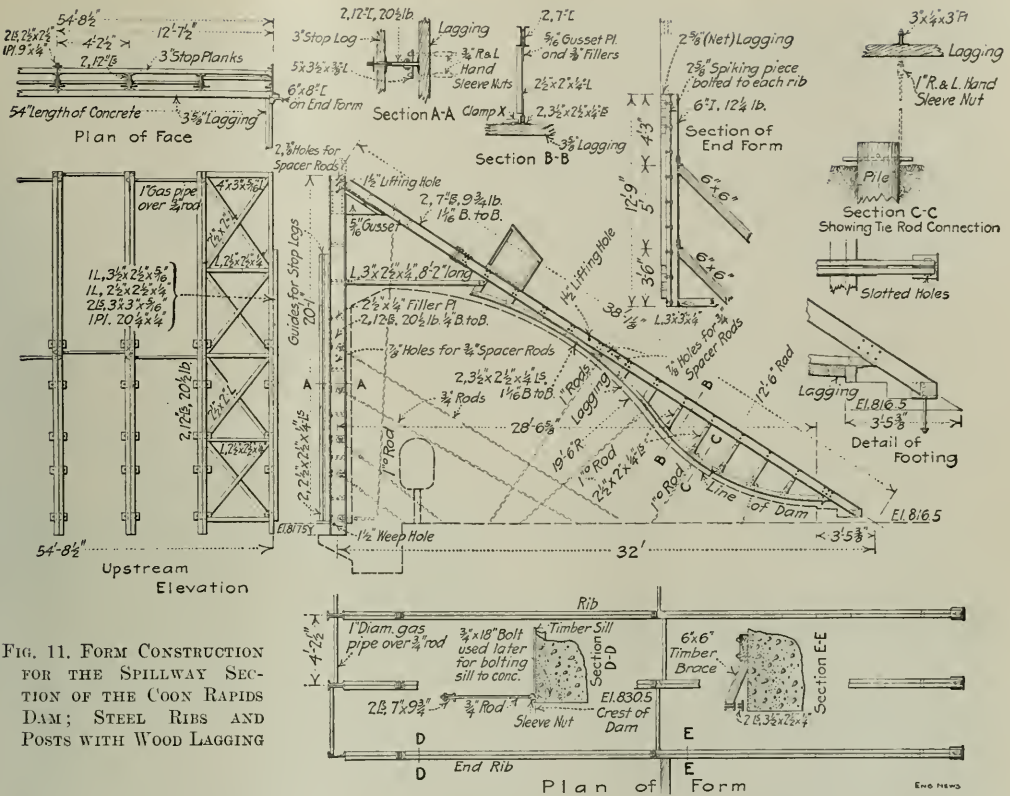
FORM CONSTRUCTION FOR THE SPILLWAY SECTION OF THE COON RAPIDS DAM; STEEL RIBS AND POSTS WITH WOOD LAGGING
